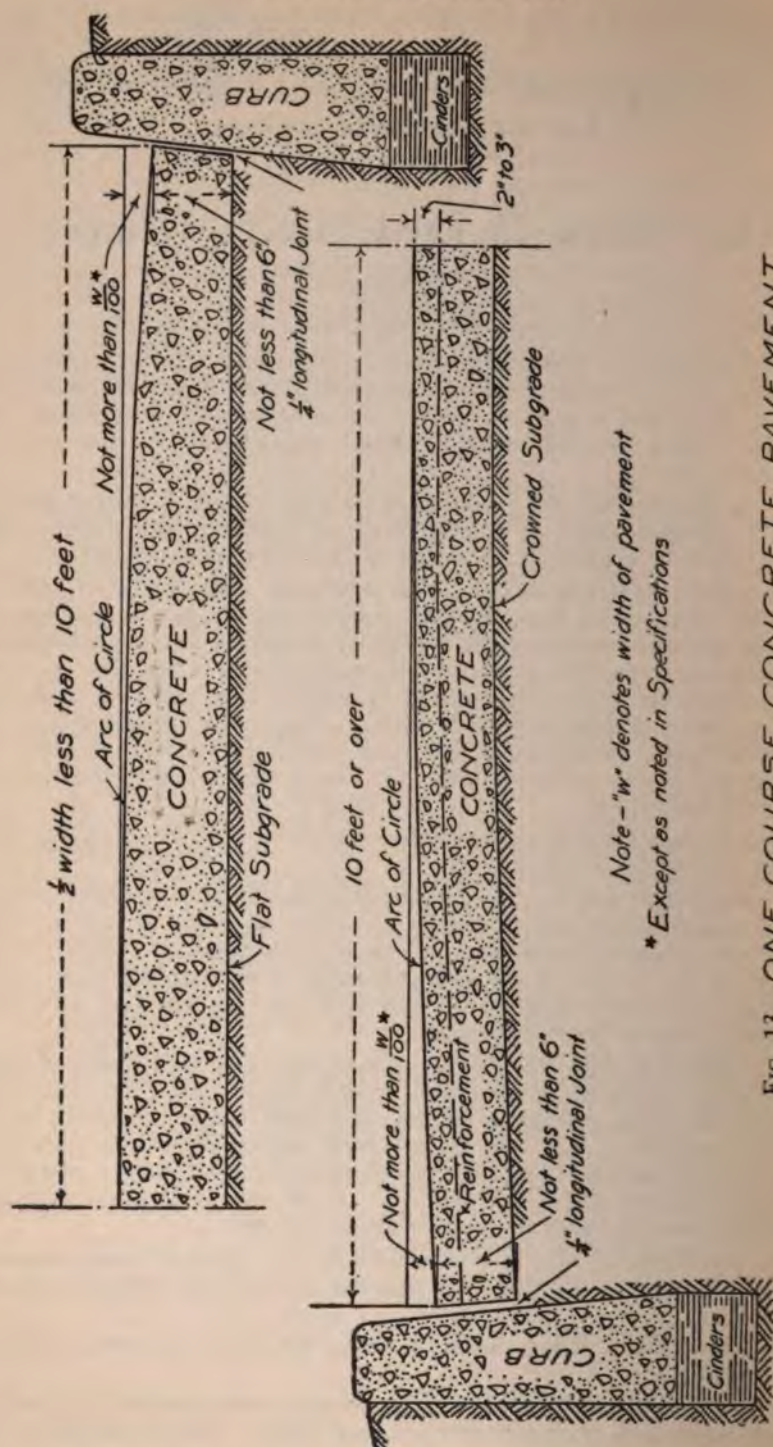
ONE COURSE CONCRETE PAVEMENT
